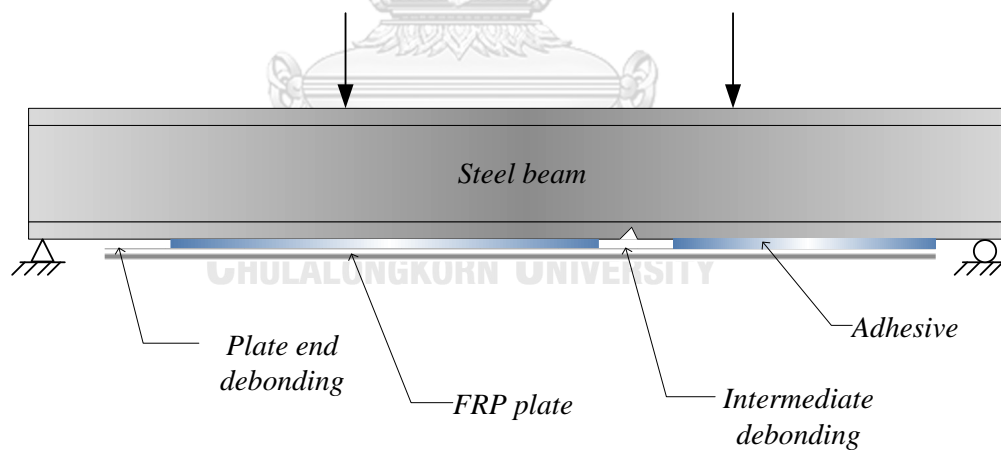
Debonding failures in FRP-strengthened steel beam.
